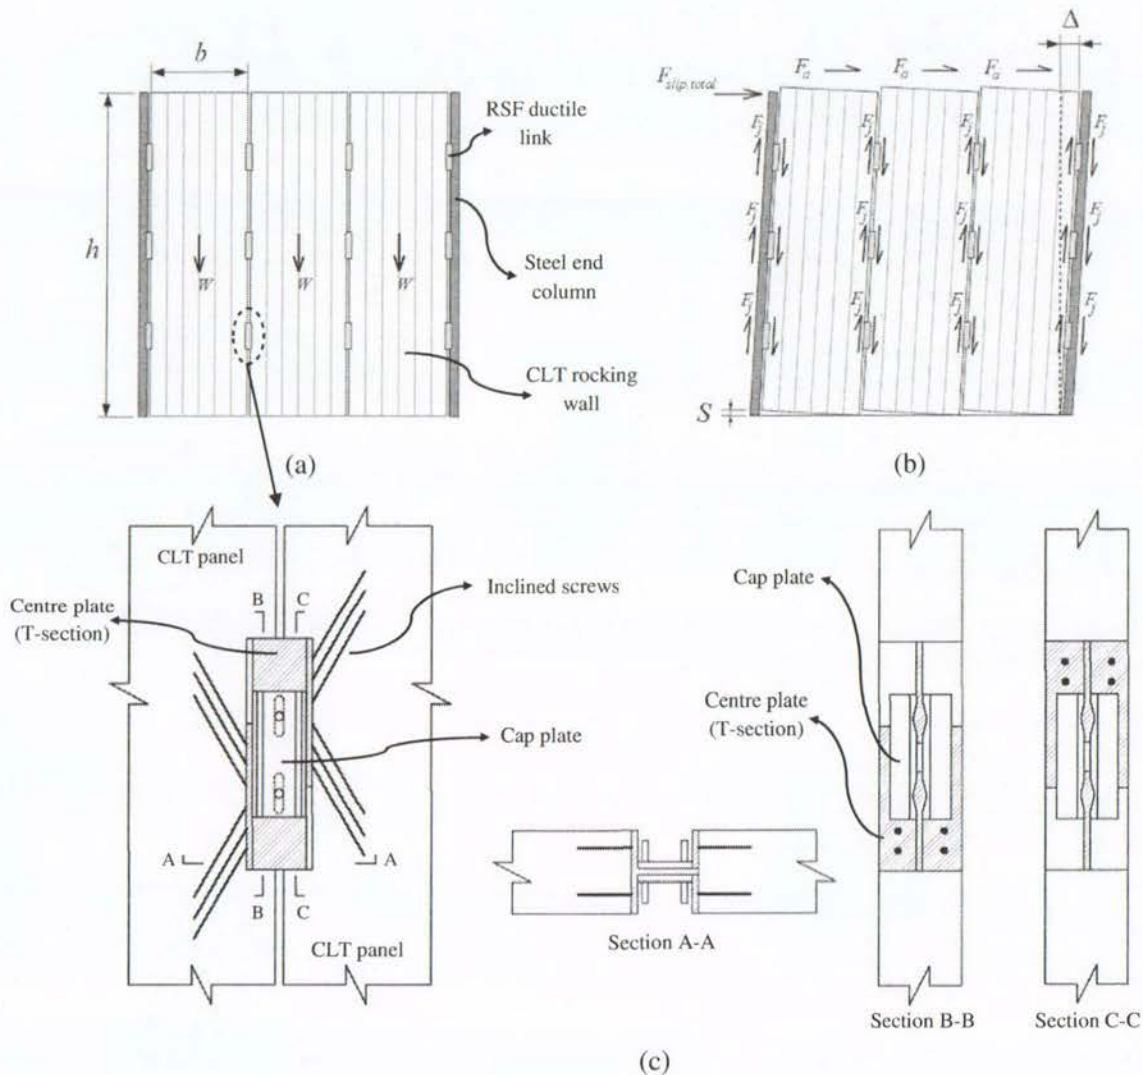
CLT coupled walls with RSF joints: a) Before rocking b) After rocking c) RSF joint to CLT panel connection.
